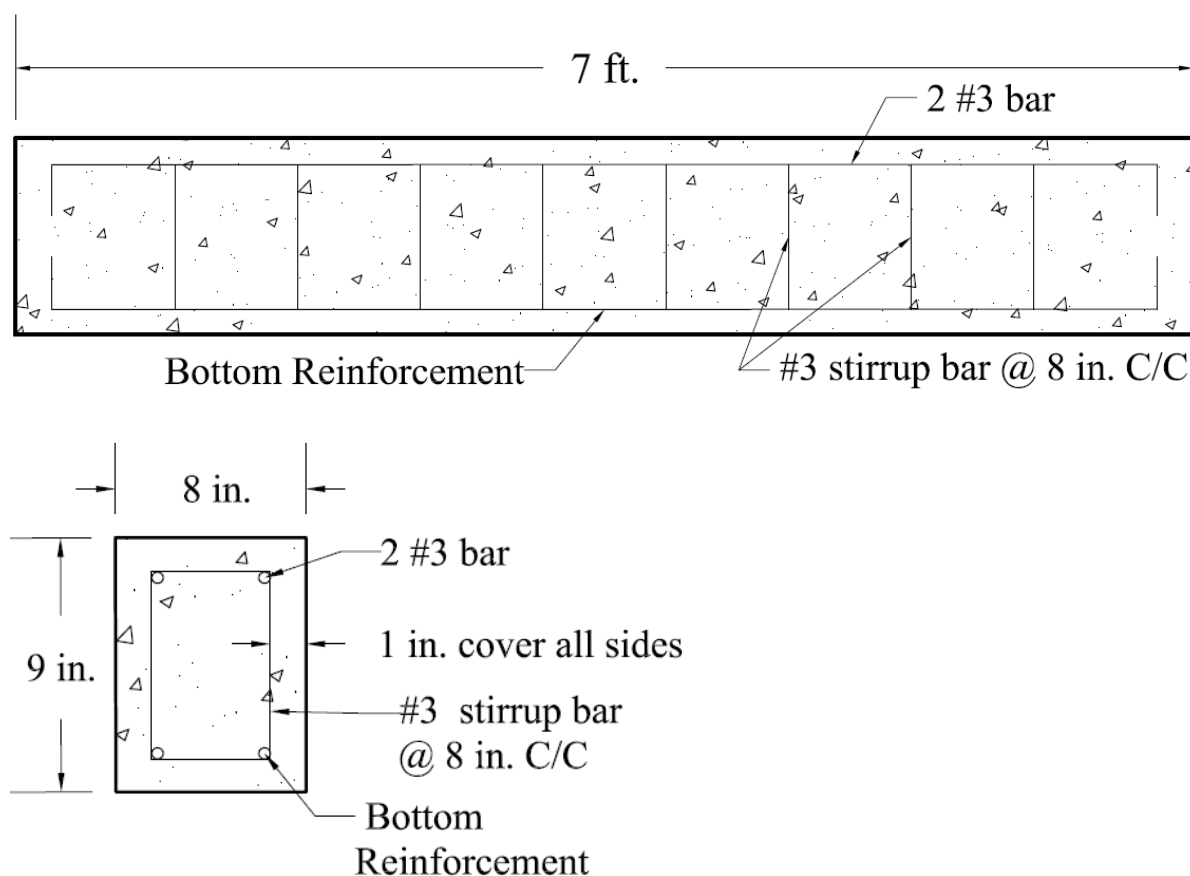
(Top) Front, (Bottom) Cross-Section Views of Beam Geometric and Reinforcement Details
